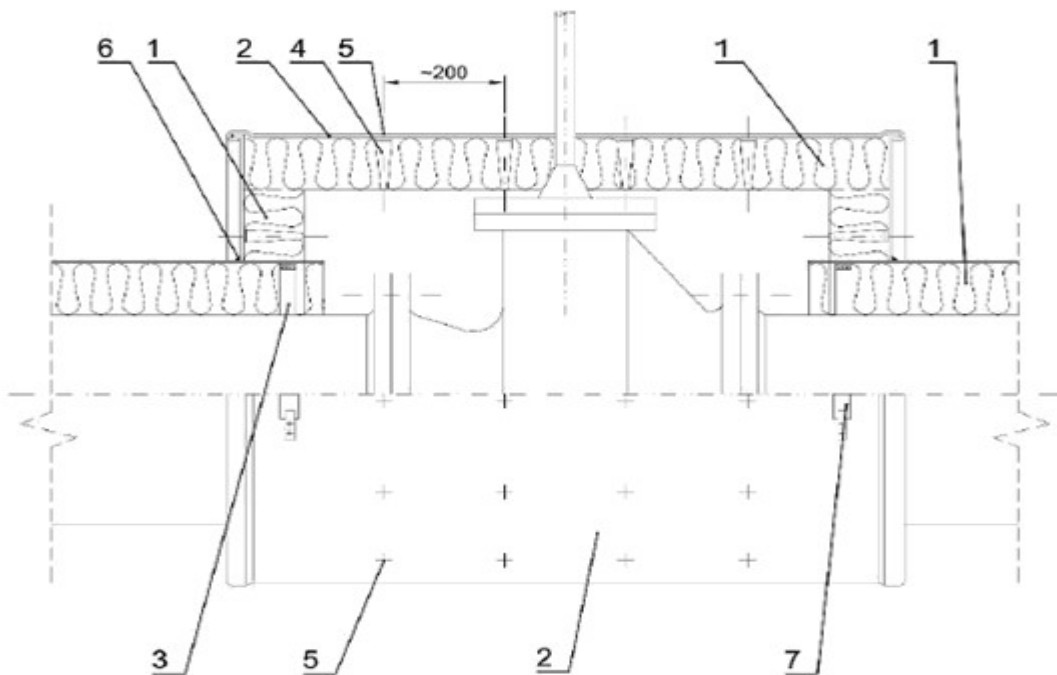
, Insulation of a flange valve on horizontal pipelines. 1– Insulation mat, 2– Insulation covering jacket, 3 – Supporting structure, 4 – Elements fastening insulation, 5 – Tubular rivet with fastening core, 6 – Sealing with silicone putty, 7 – Hood lock
